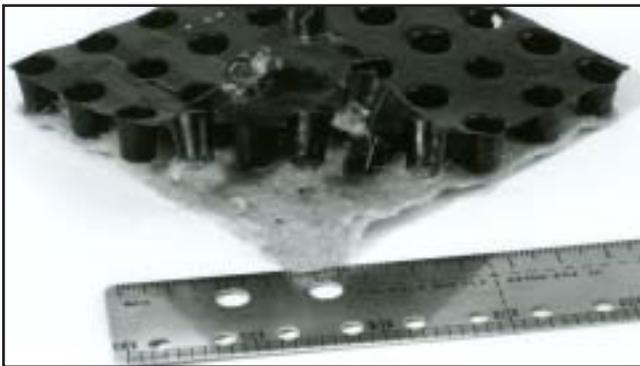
Sheet drains have a large cross-section that provides significant drainage capacity. If placed under the trail tread, orient the sheet drain with the geotextile side on the bottom and the plastic core on top. This orientation reduces the amount of fill needed.
